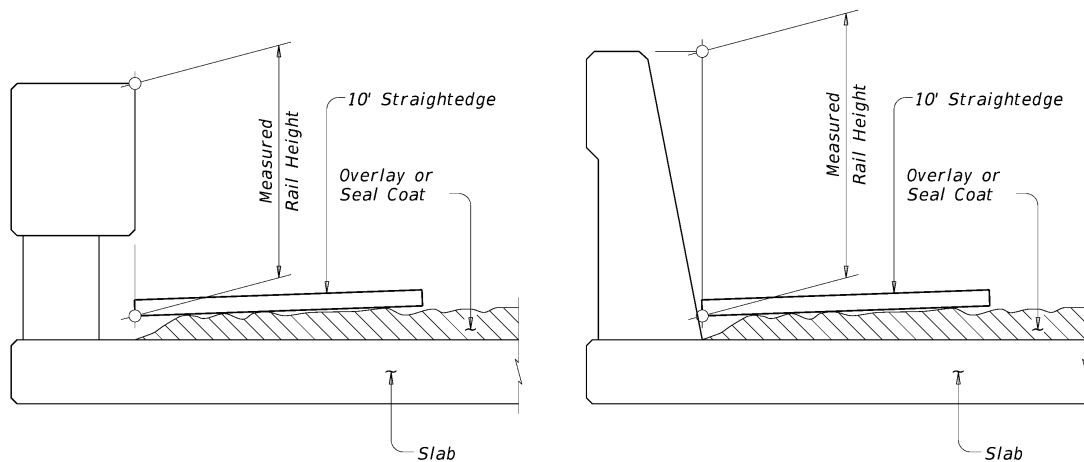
Measuring bridge railing height with overlay or seal coat
